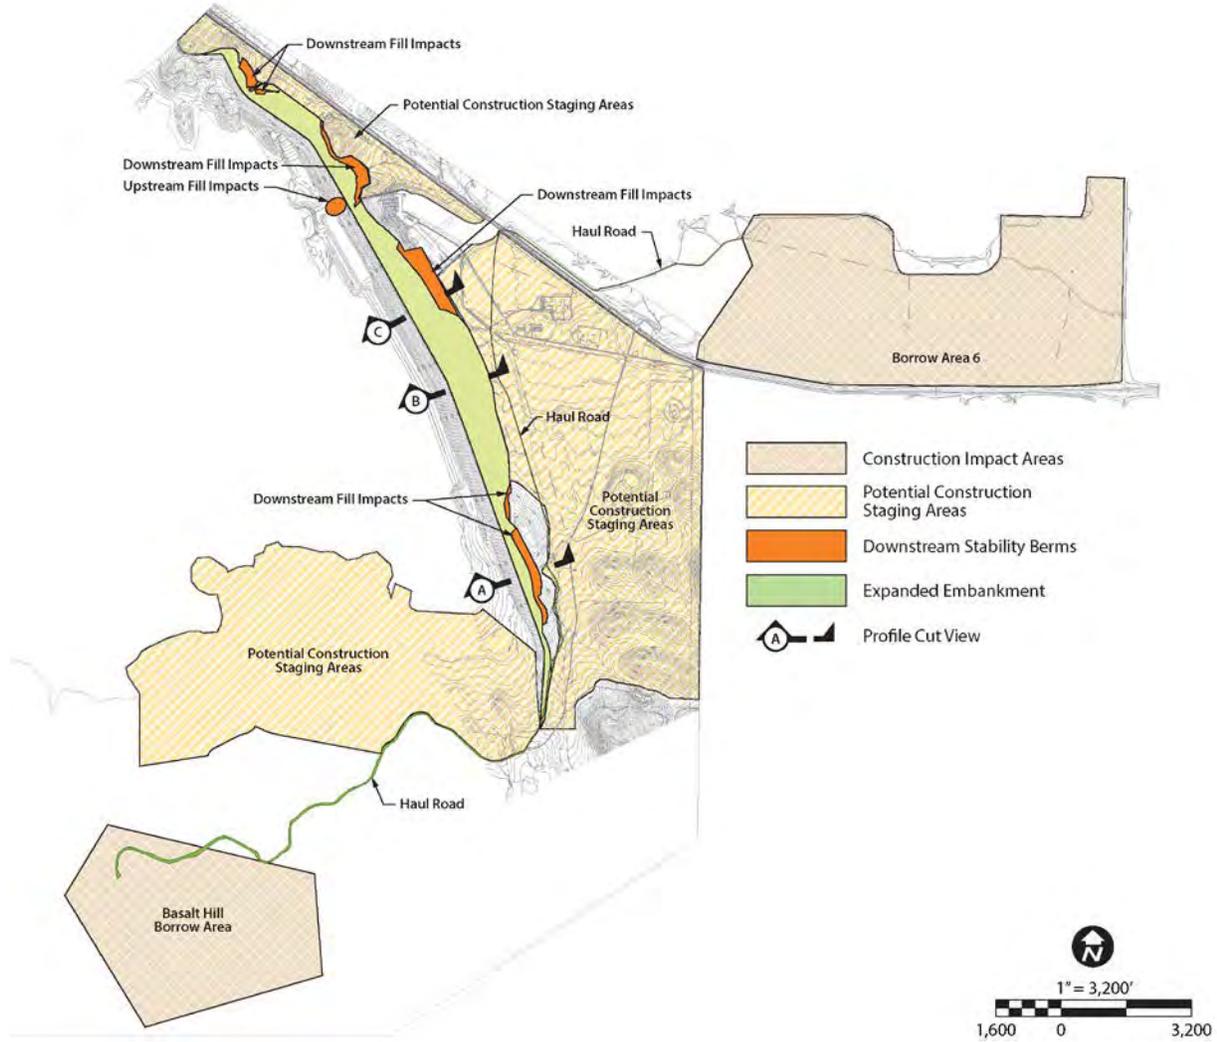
Reservoir Enlargement Construction and Staging Areas
